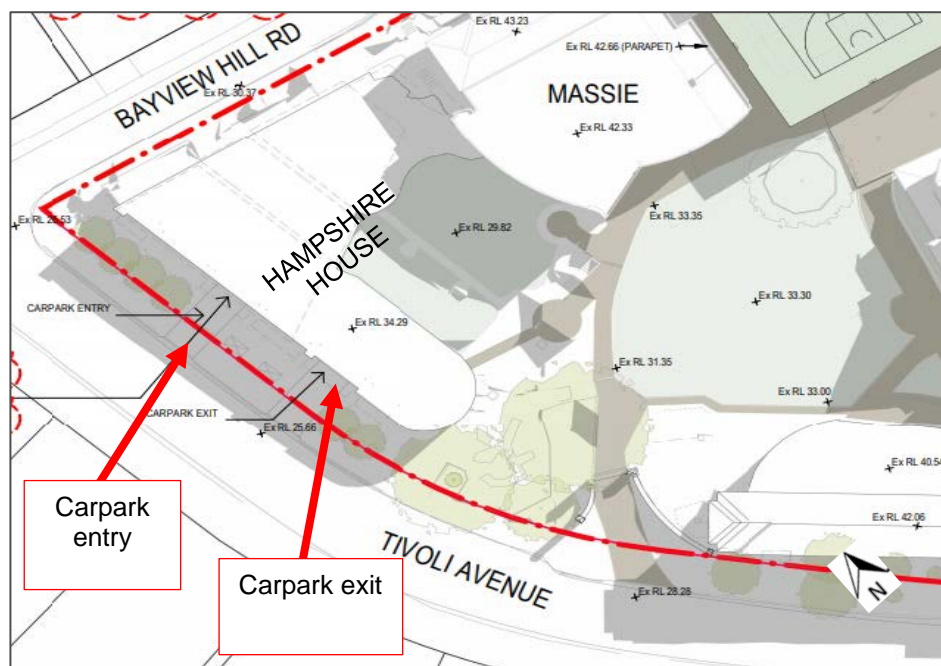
| Site access arrangements (Source: Applicant's EIS 2020)
